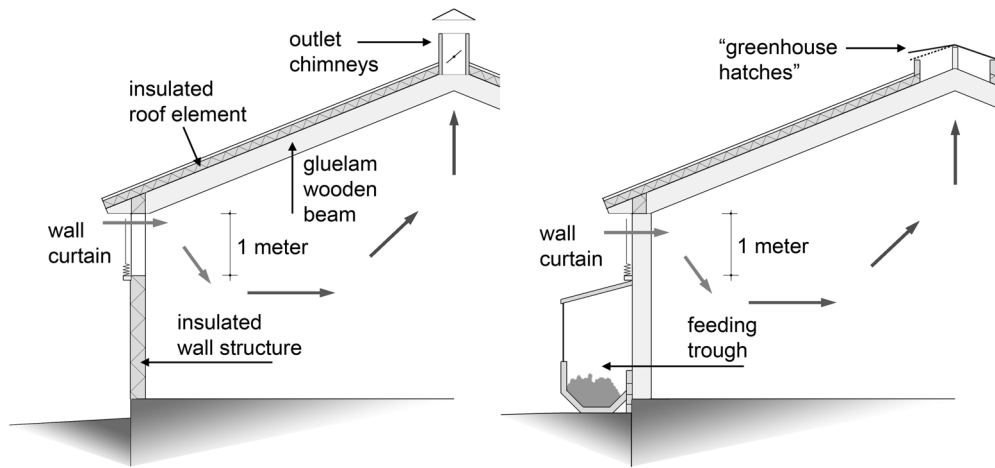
Ventilation inlet and outlet technologies in measured barns. In all cases walls and roof were insulated, the inlet opening was one meter (when fully open) and outlet openings had several types, chimneys and the whole ridge long greenhouse hatches
